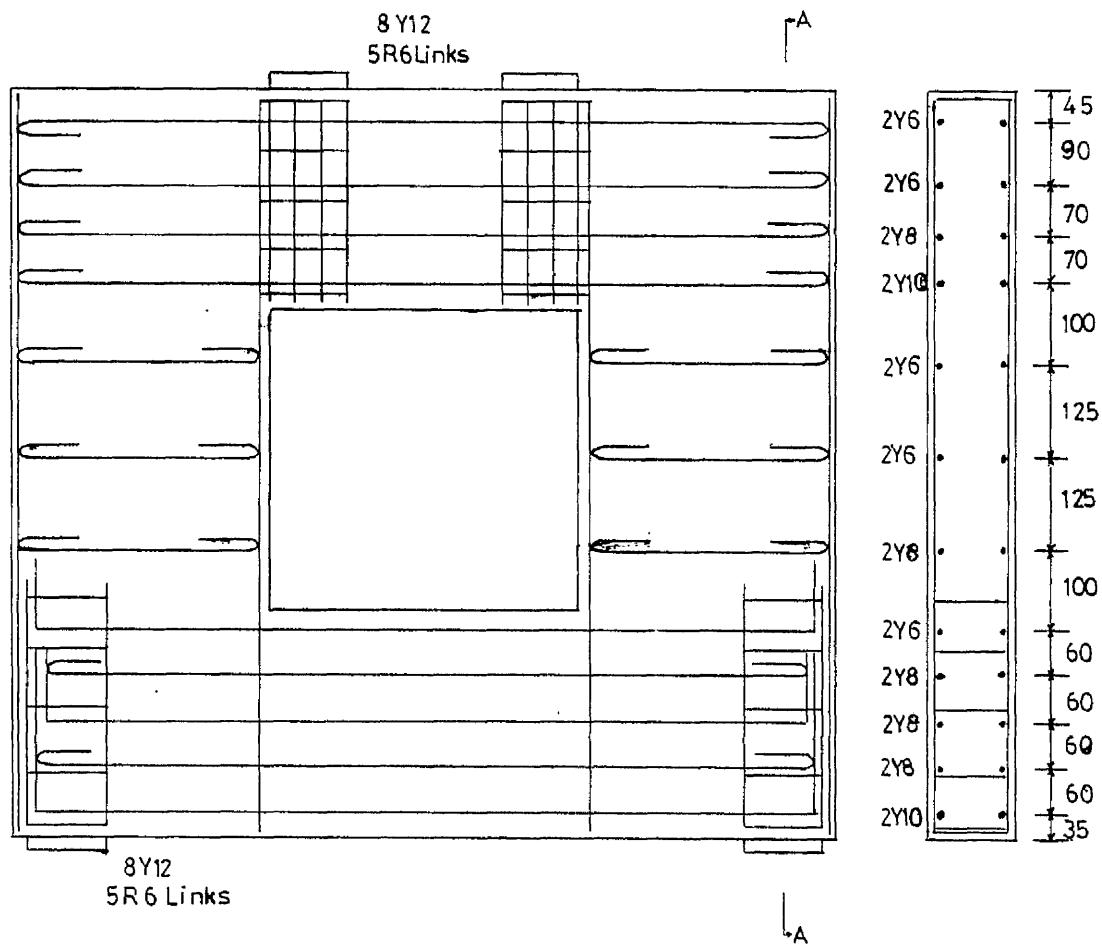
ARRANGEMENT OF REINFORCEMENT FOR BEAM B3. SECTION A-A.
